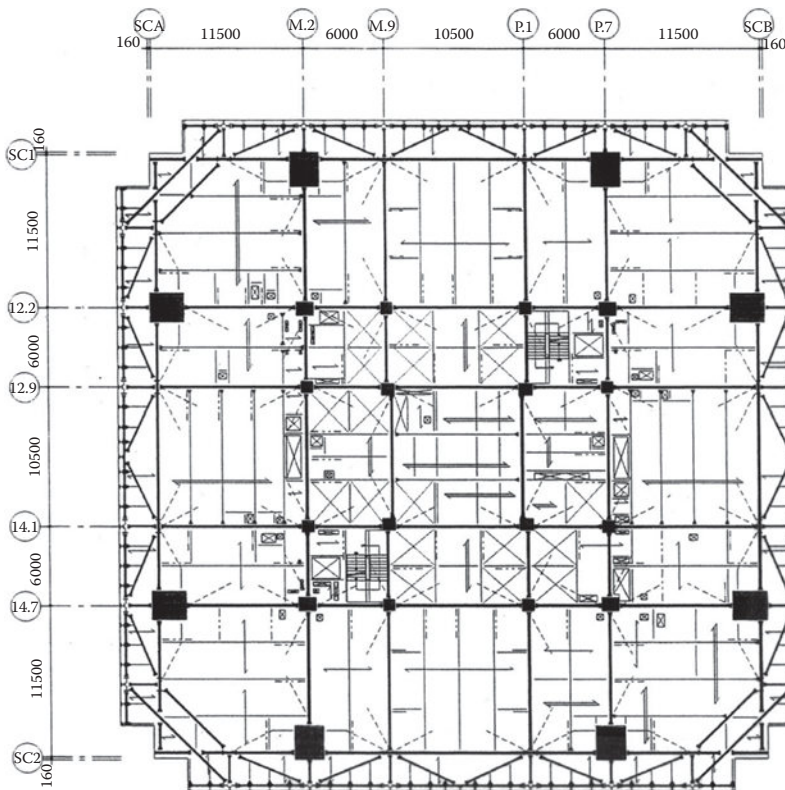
Framing plan for level 50, Taipei 101. The structure consists of a dual system of a braced core connecting to a perimeter sloping frame at each sloping face. The core diagonal and chevron braces are interconnected to vertical supercolumns via outrigger and belt trusses. The supercolumns at the base are 2.4×3.0 m (approximately 8 ft \times 10 ft).
